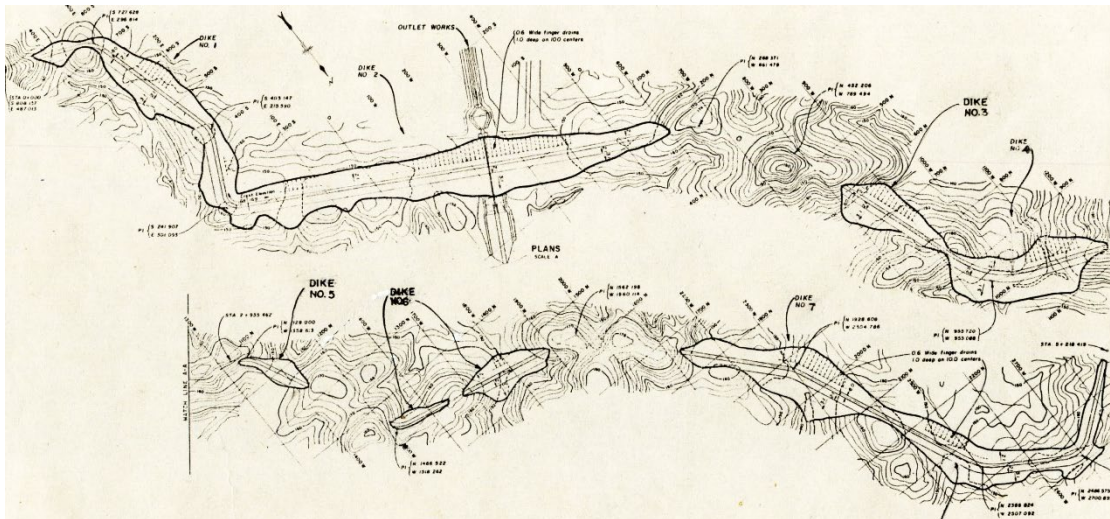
Plan view of SRK Dam (Royal Irrigation Department 1975).
